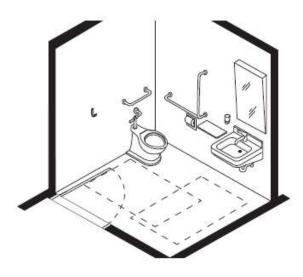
B Universal washroom with inward swinging door
